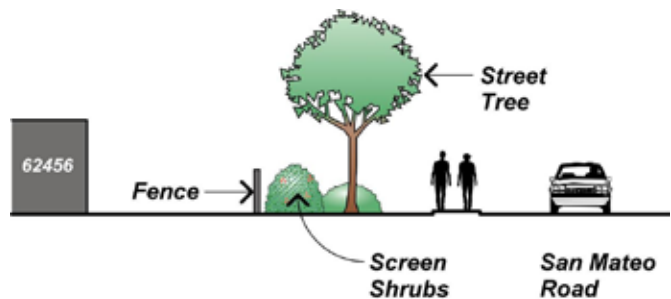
Typical detail for screening buildings along San Mateo Road.
